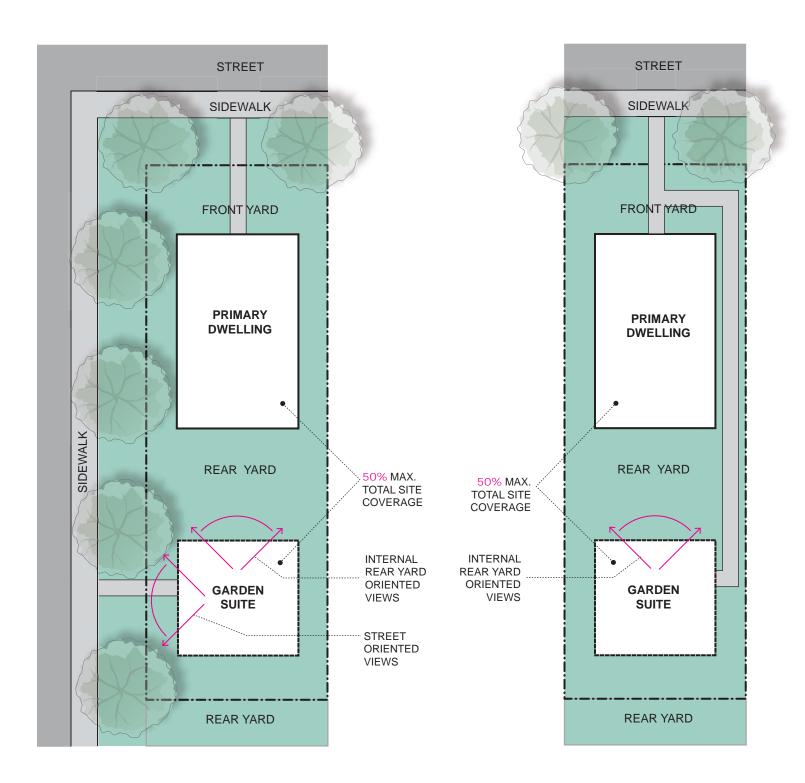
GARDEN SUITES - SUITE LOCATION, ORIENTATION AND SITE COVERAGE
